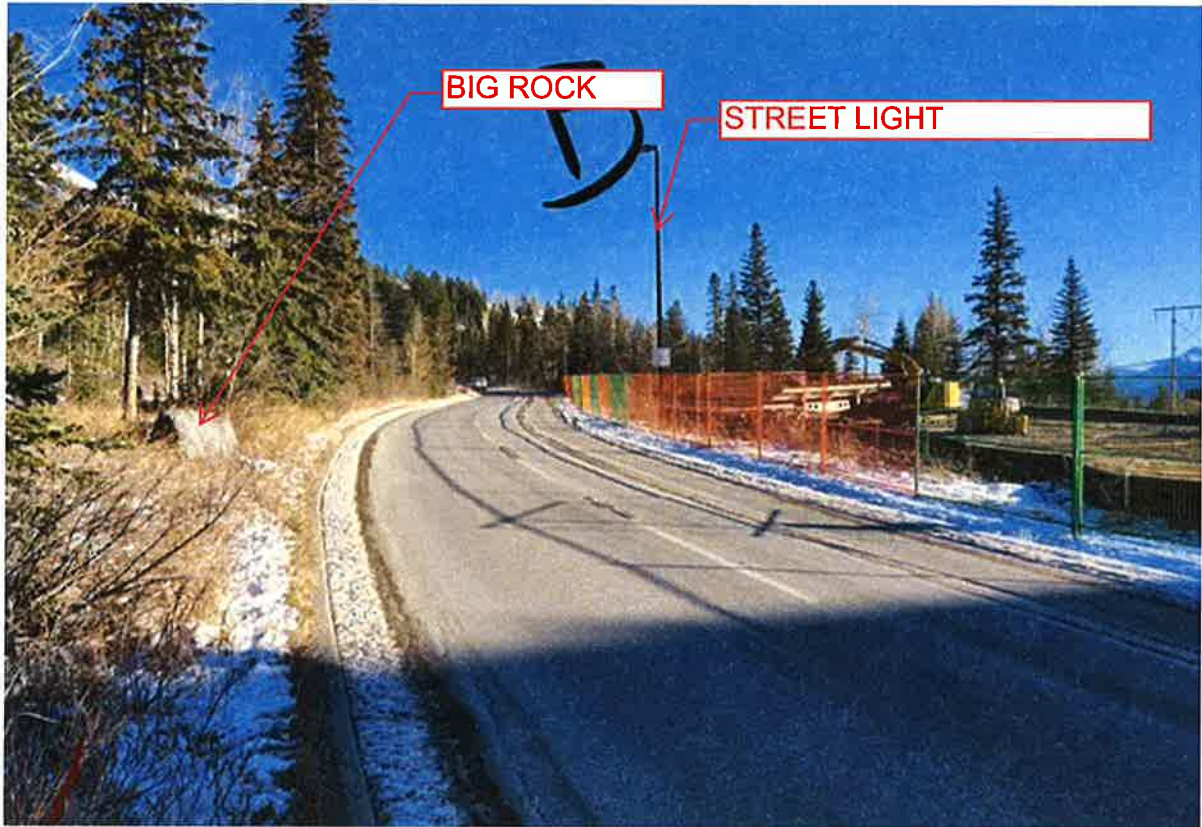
& 4. Photo from Silvertip Trail, facing uphill. Basecamp land on right-hand side of road. Photo taken under the Overhead Power Lines
